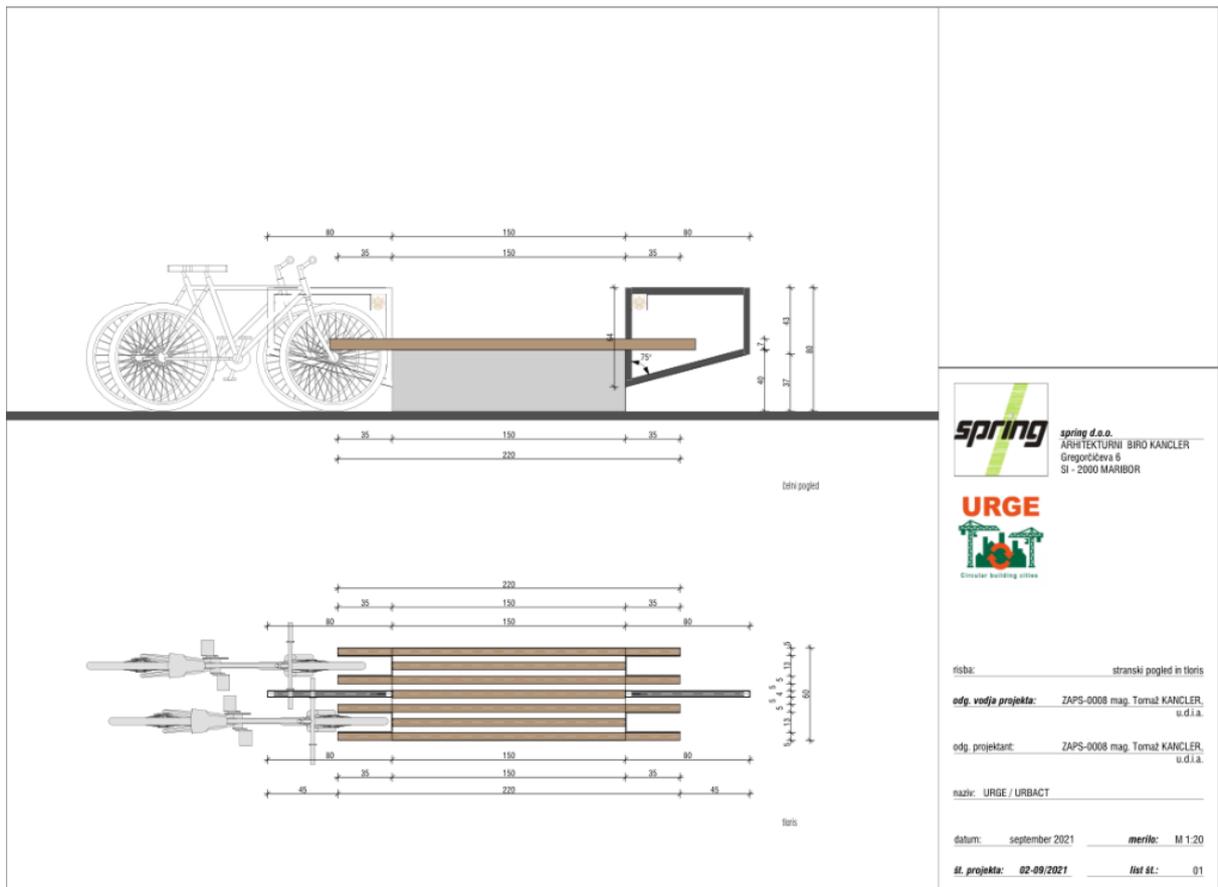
Technical drawing of micro-urban fixtures (Nigrad Maribor)
